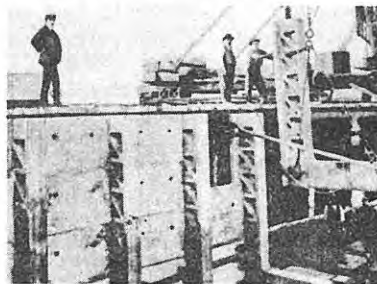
One of the methods for solving Sydney's rat plaque was to build smooth-faced concrete sea walls using precast reinforced concrete units.
